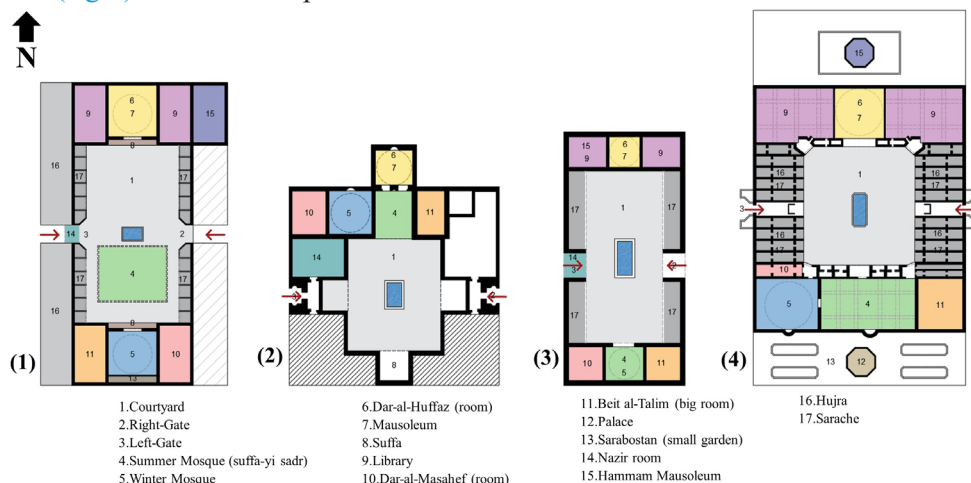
Proposed plans of the Rowza. Source: Plan (1): Saeednia, 2000; Plan (2): Blair, 2008; Plan (3): Belali Oskuie et al., 2010; Plan (4): Shekari Niri et al., 2019.
